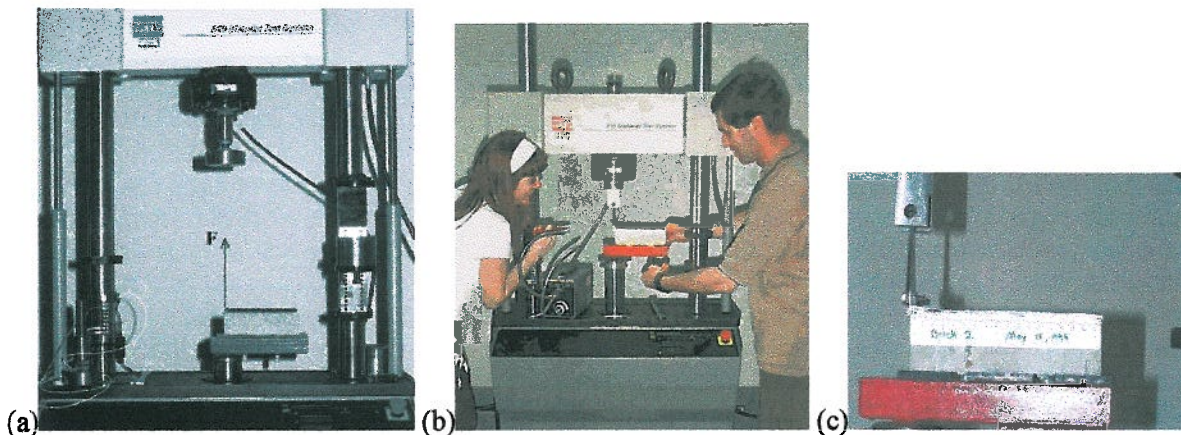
Experimental setup for determining the fracture toughness of the bond between the composite overlay and the concrete substrate: (a) test machine and specimen indicating the loading direction; (b) mounting of specimen #1; (c) close up view of the specimen #2 showing the eye and clevis joint fixture.
